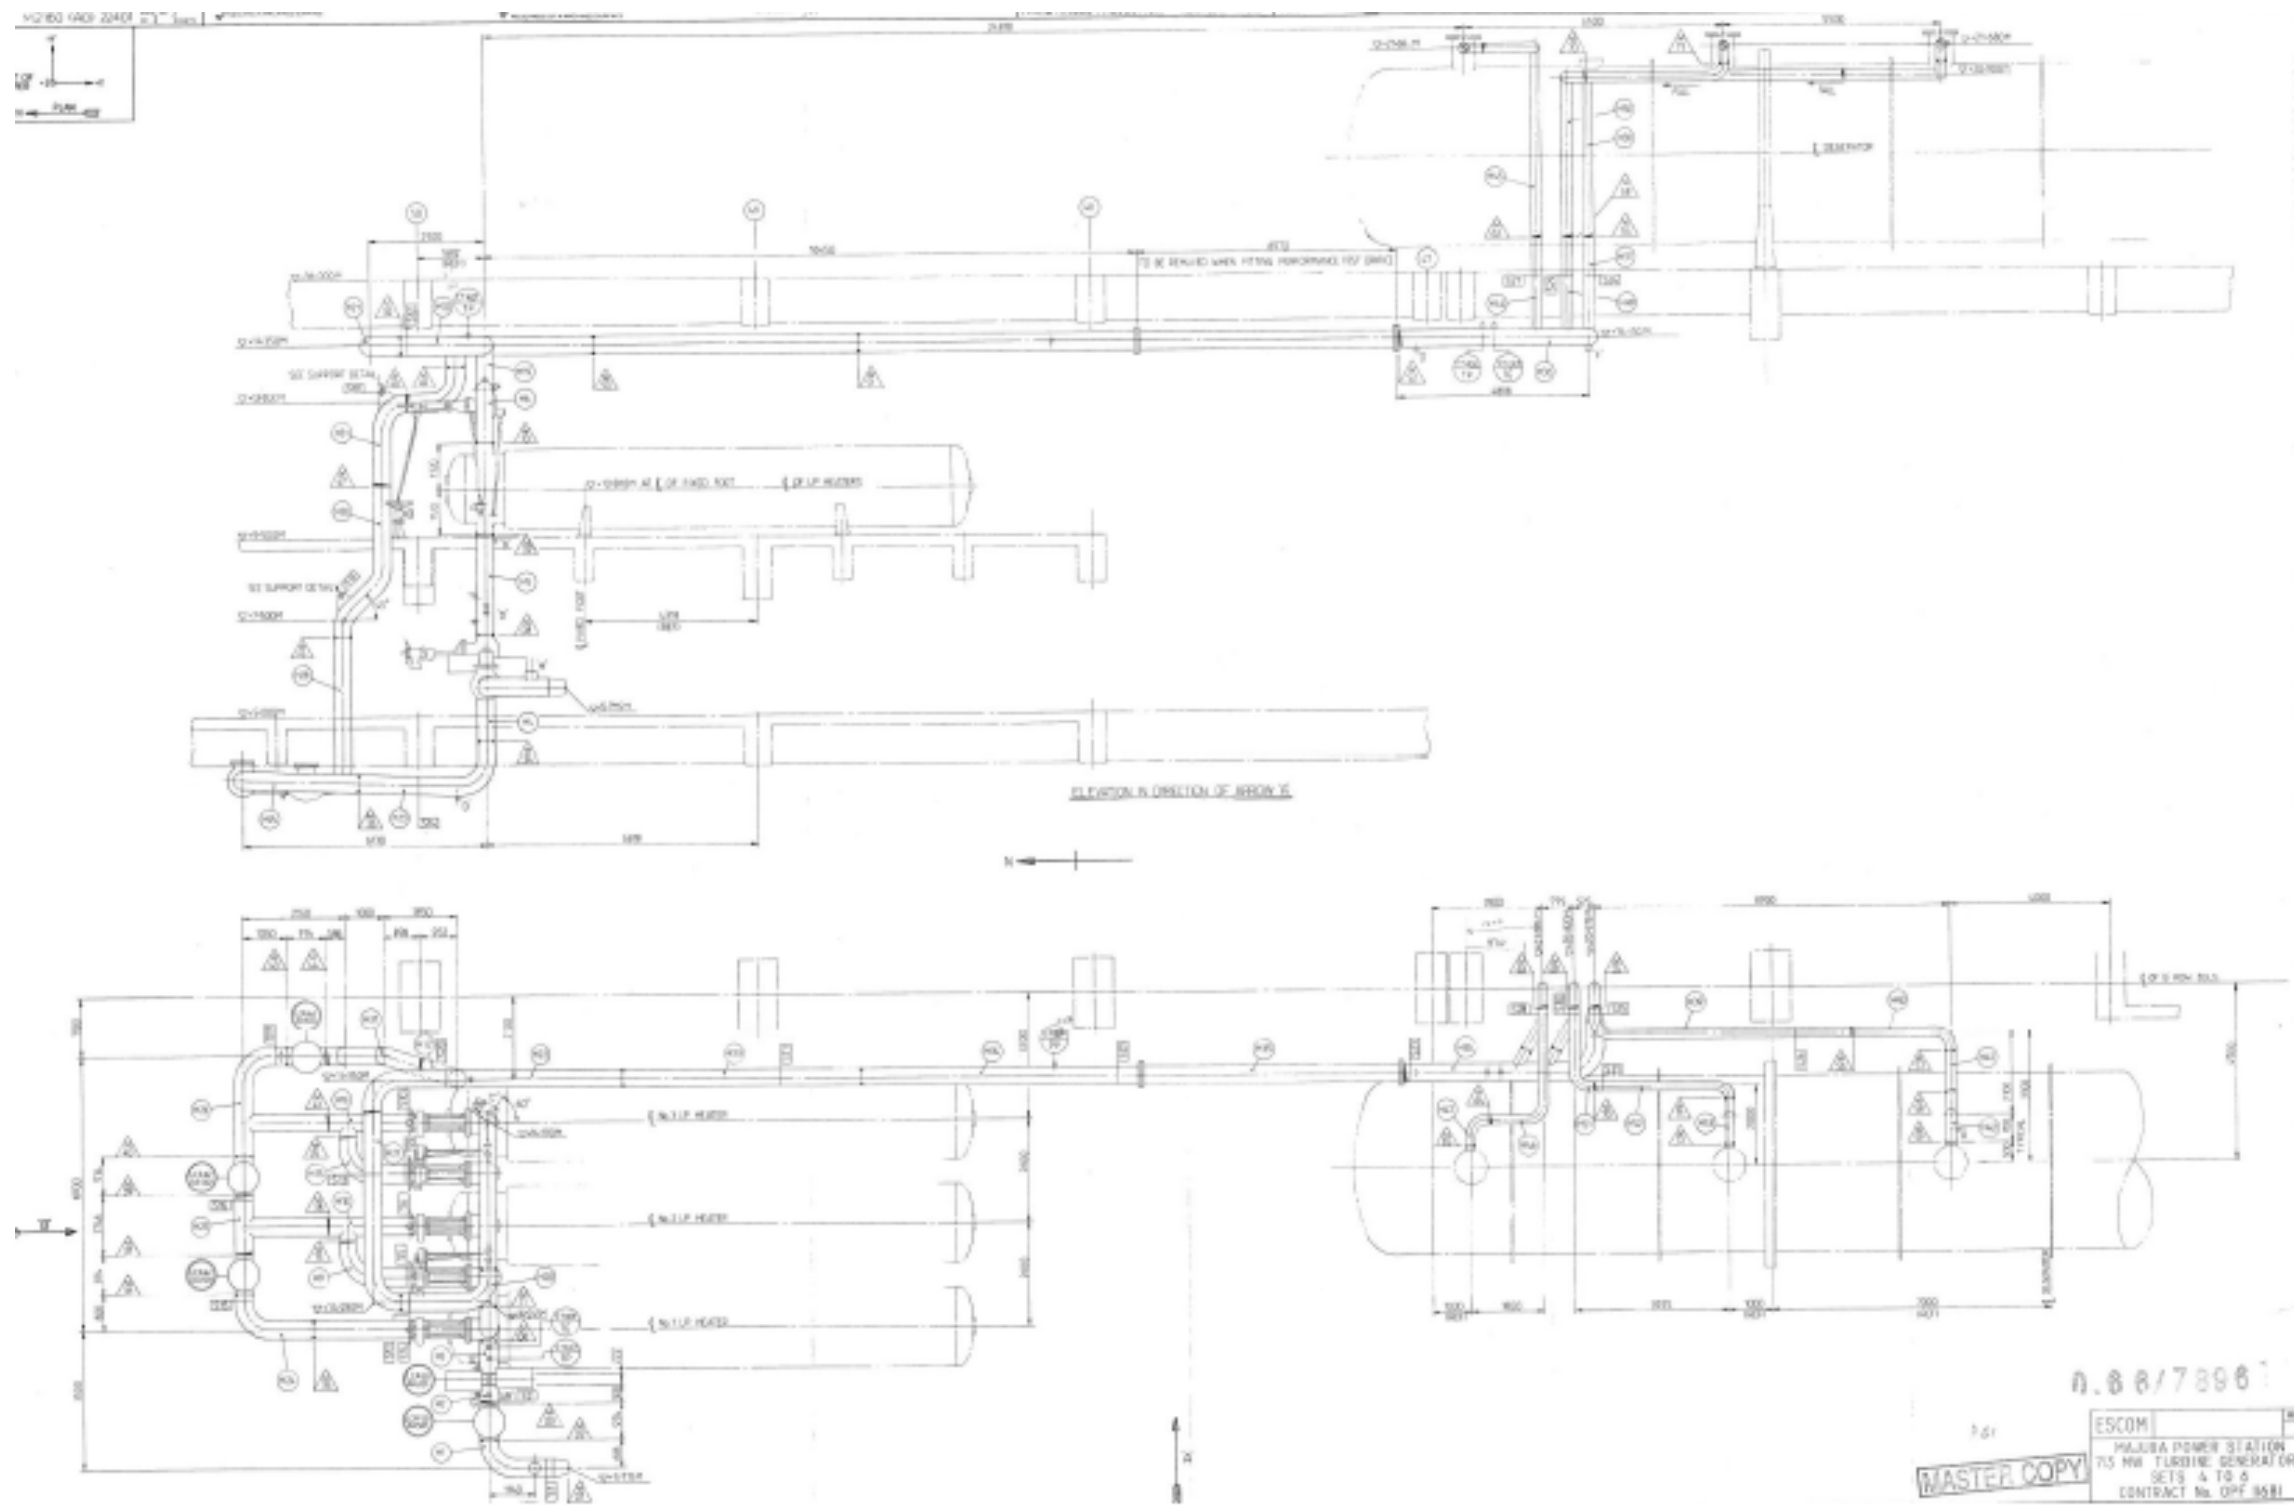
LP Feed-Heating System Detailed Plant Arrangement Drawing
